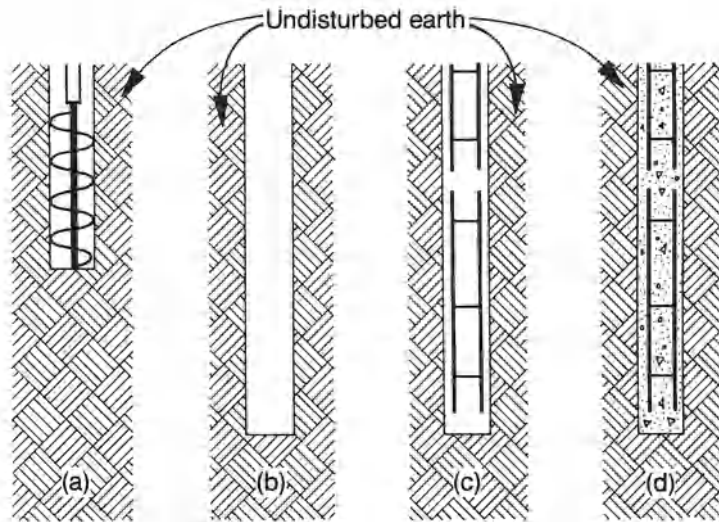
Installation of a pier in clay, using continuous flight auger.
